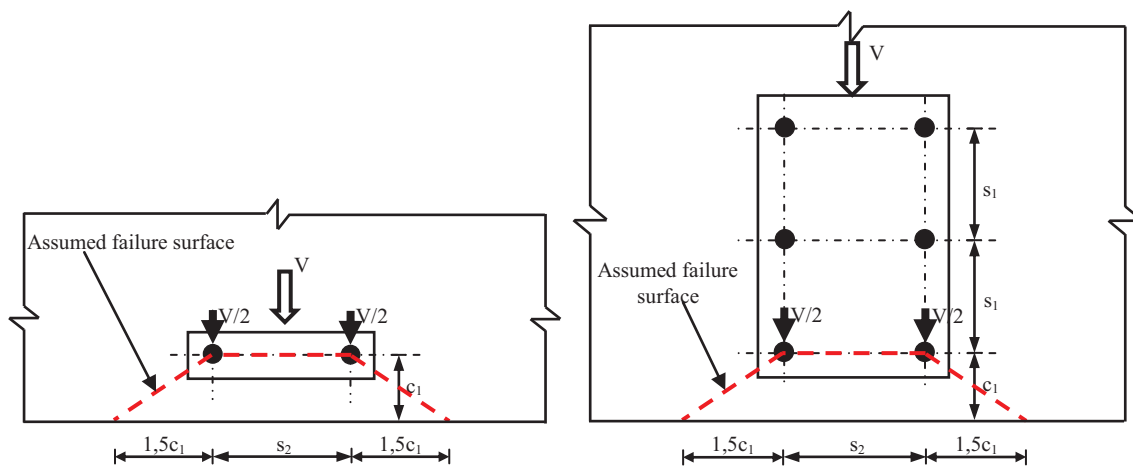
Assumption of failure surface for anchor groups loaded in shear perpendicular to the edge
